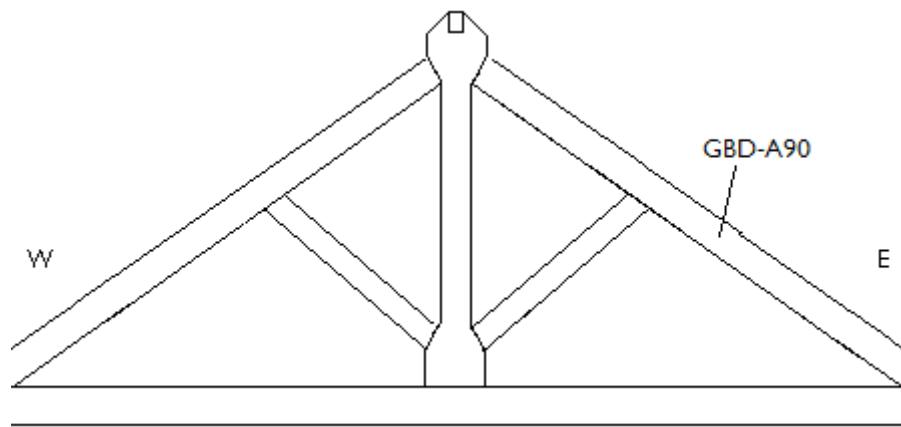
Threshing barn; sketch of truss 1, showing the location of sample GBD-A90
